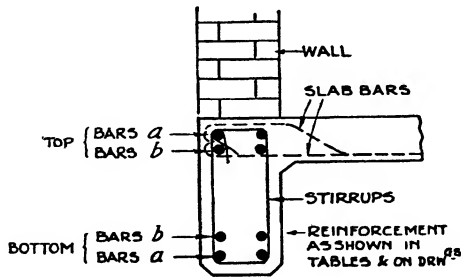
SECTION THROUGH CENTRE OF WALL BEAM OR EXTERNAL BEAM.
